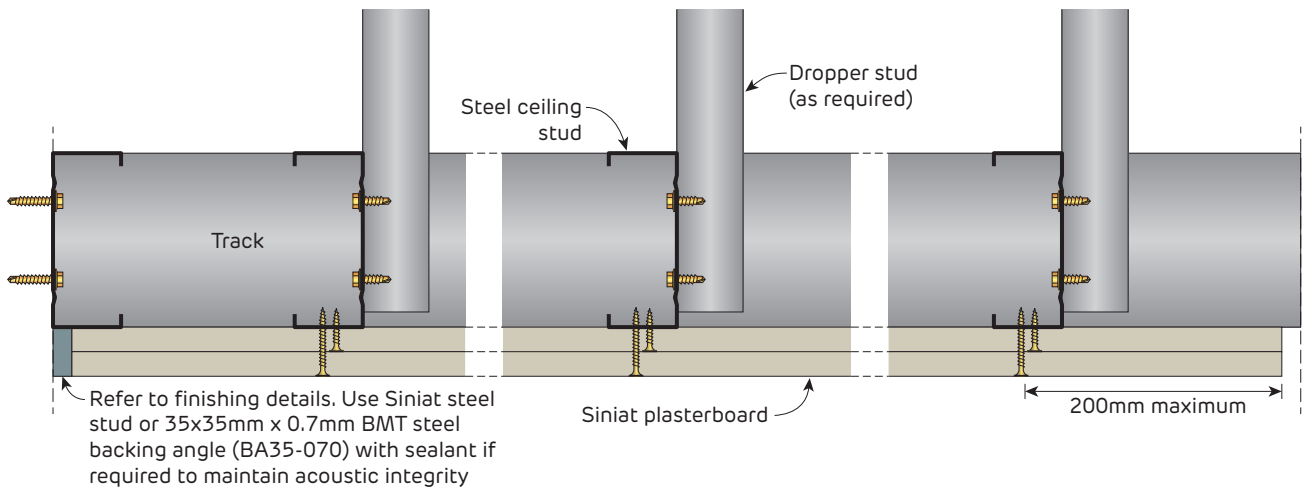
Stud Ceiling Type C1 - 2-way Plenum Braced
